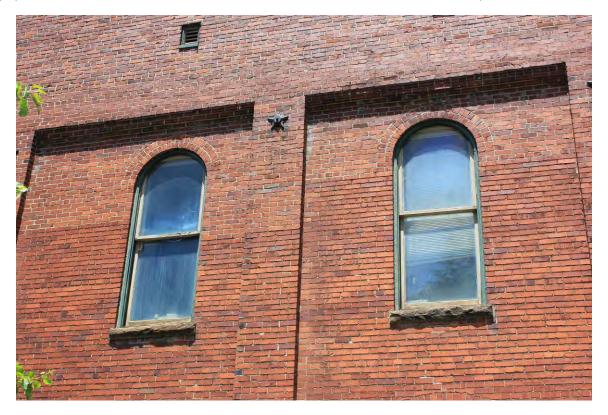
Detail: Arched sash windows and star tie rod anchor on south elevation
